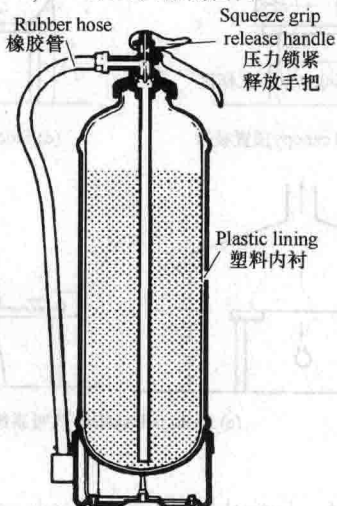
Section through a stored pressure type of water extinguisher 储存压力水灭火器剖面图
